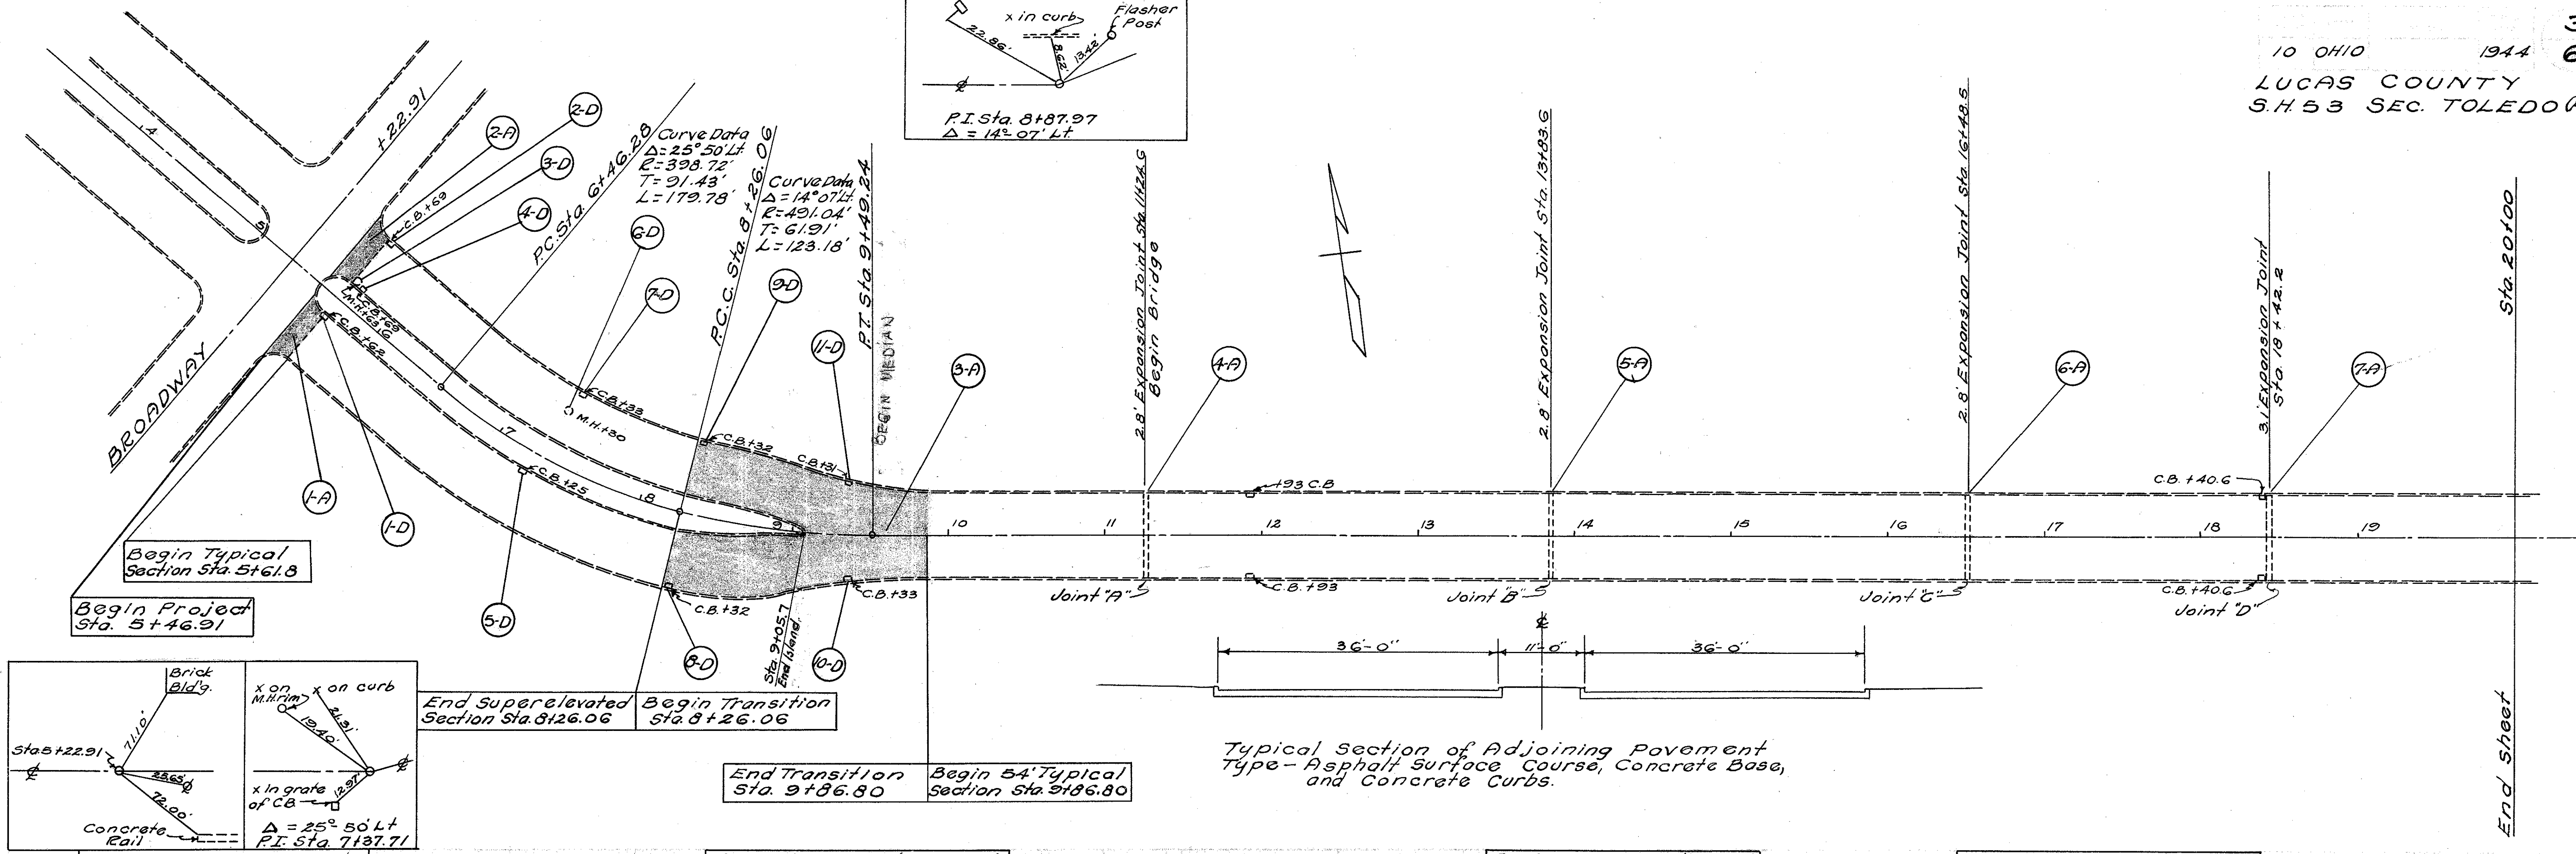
DETAIL SHOWING ASPHALTIC CONCRETE ADJACENT TO RAISED EXPANSION JOINTS
